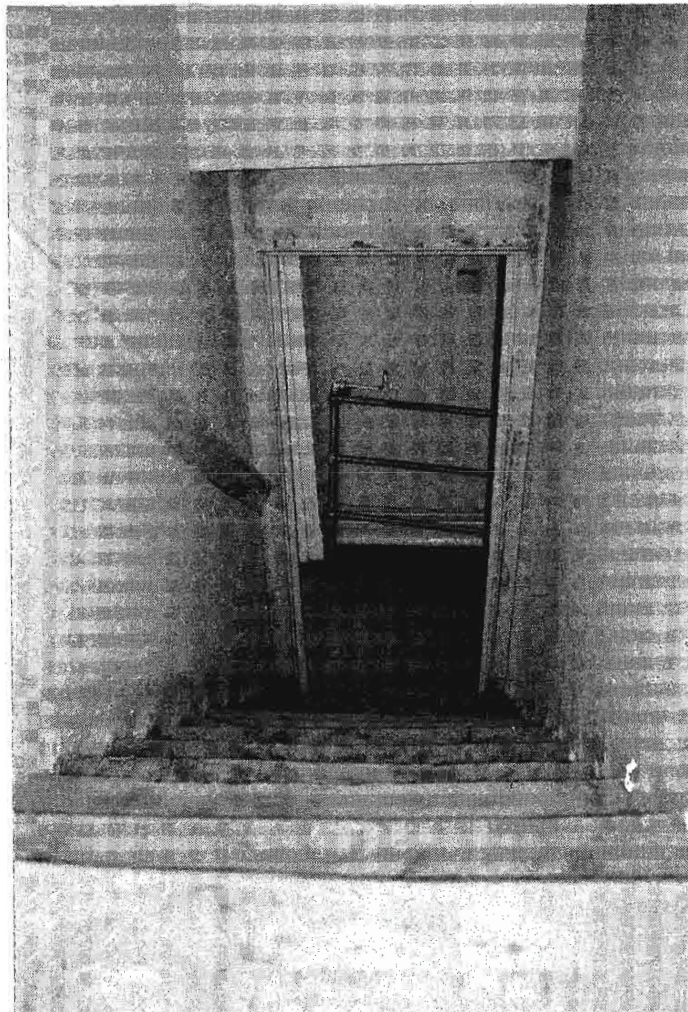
second floor window to west of 19<sup>th</sup> century build, see also *Plates 14 and 15*.
